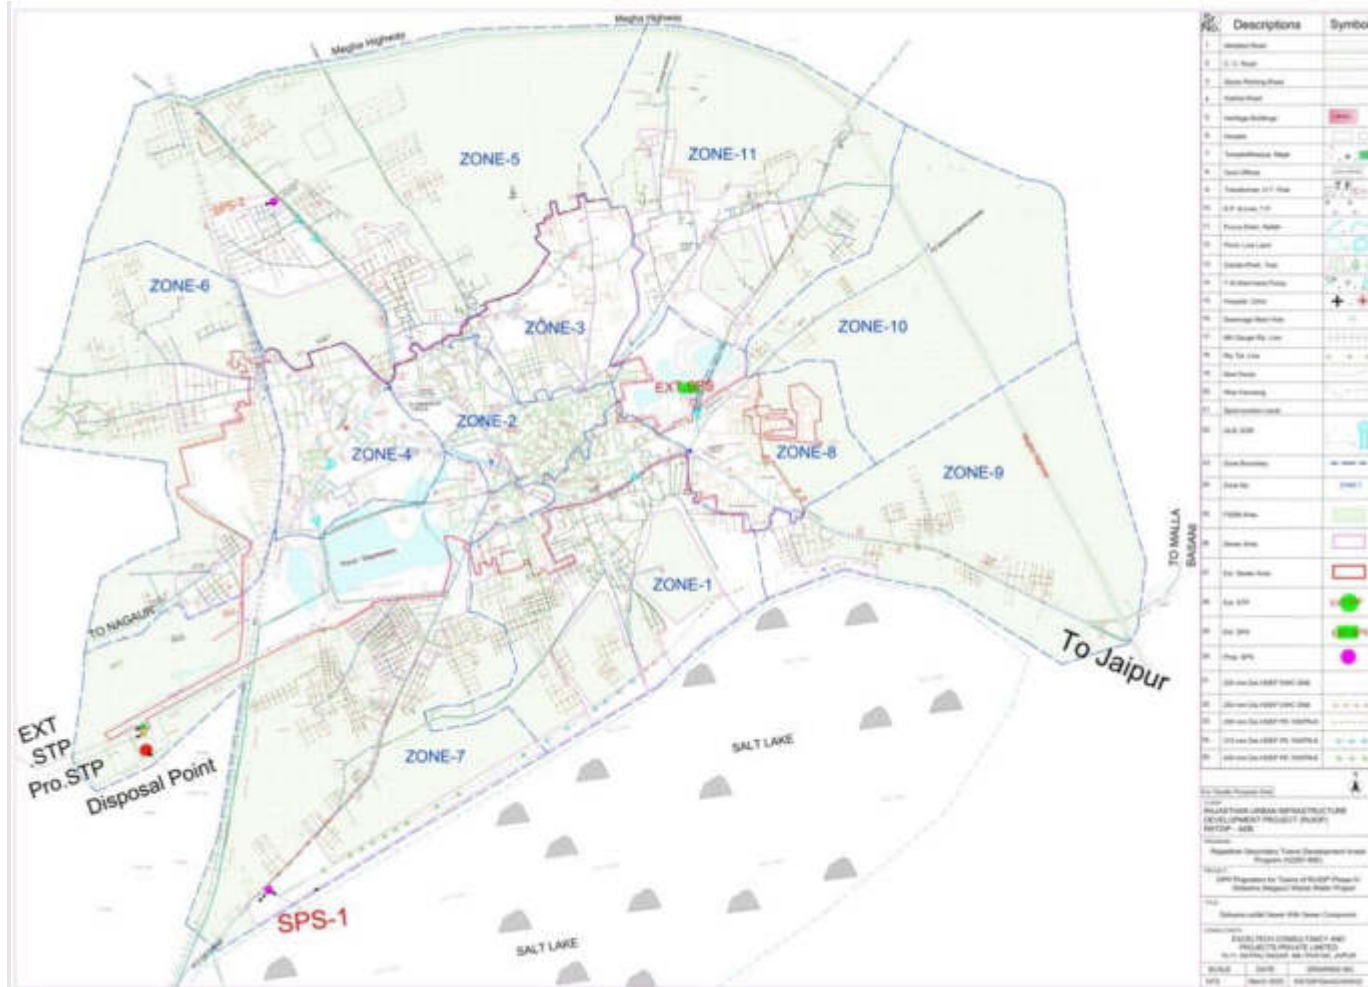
Layout of Sewer Network showing Trenchless Trunk Line, FSSM area, STP and SPSs
